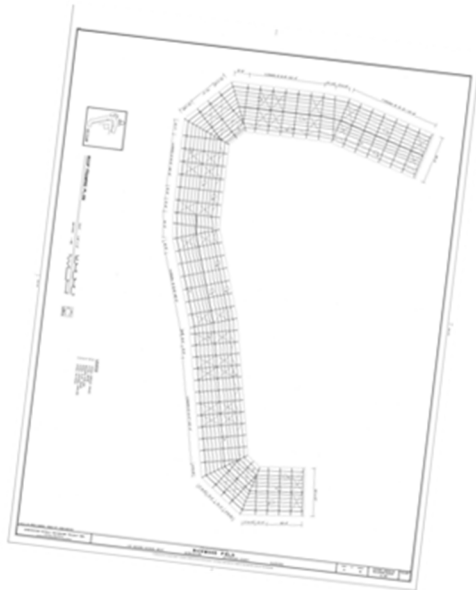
Roof framing plan juxtaposed at similar scale with the site plan for reference.²¹⁹
